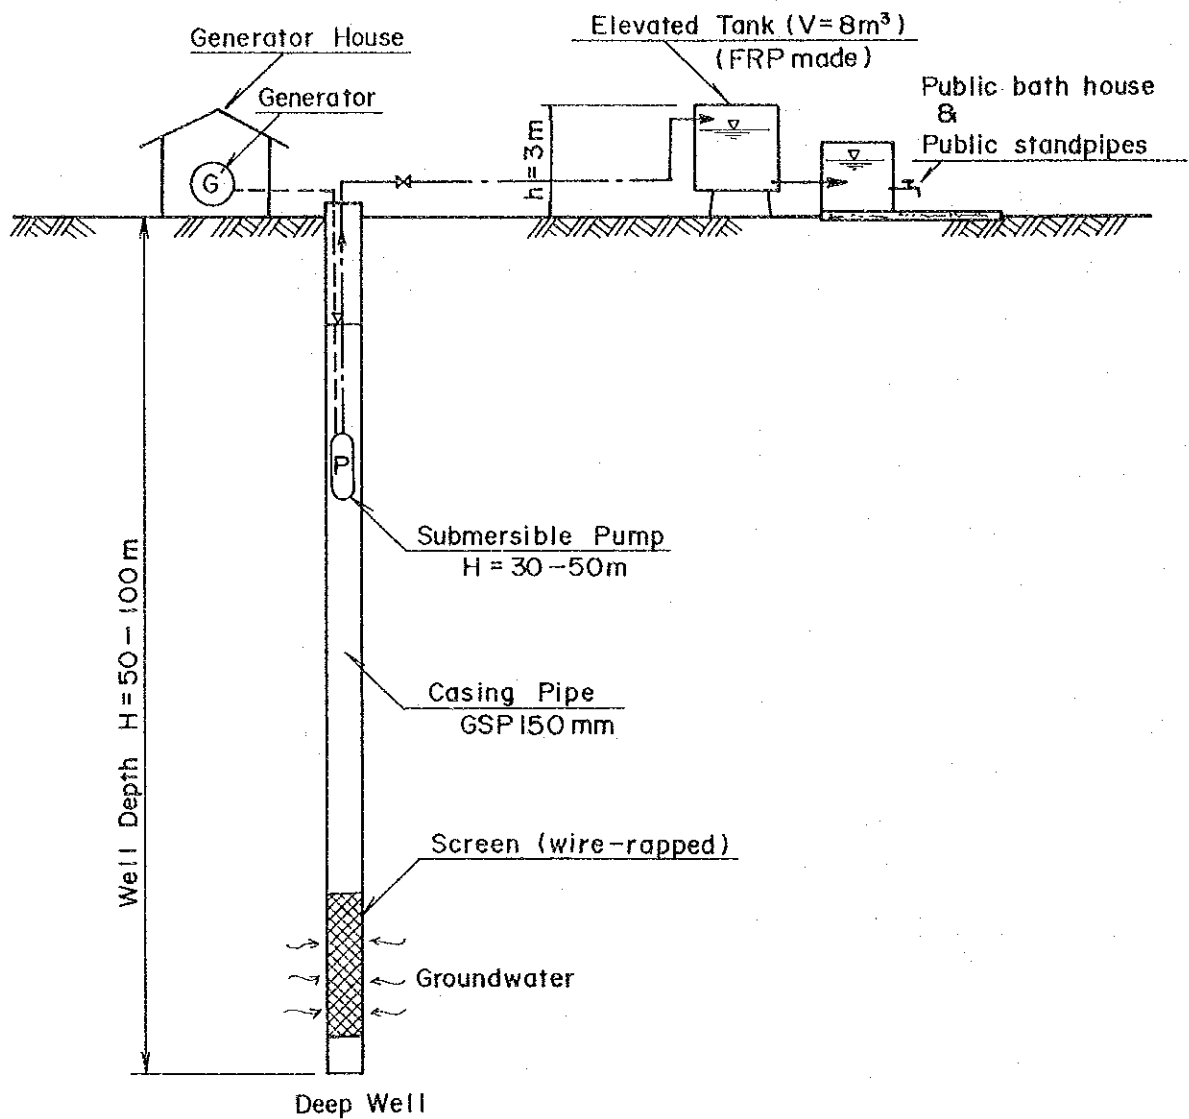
GENERAL PLAN OF WATER SUPPLY FACILITY - TYPE II -
